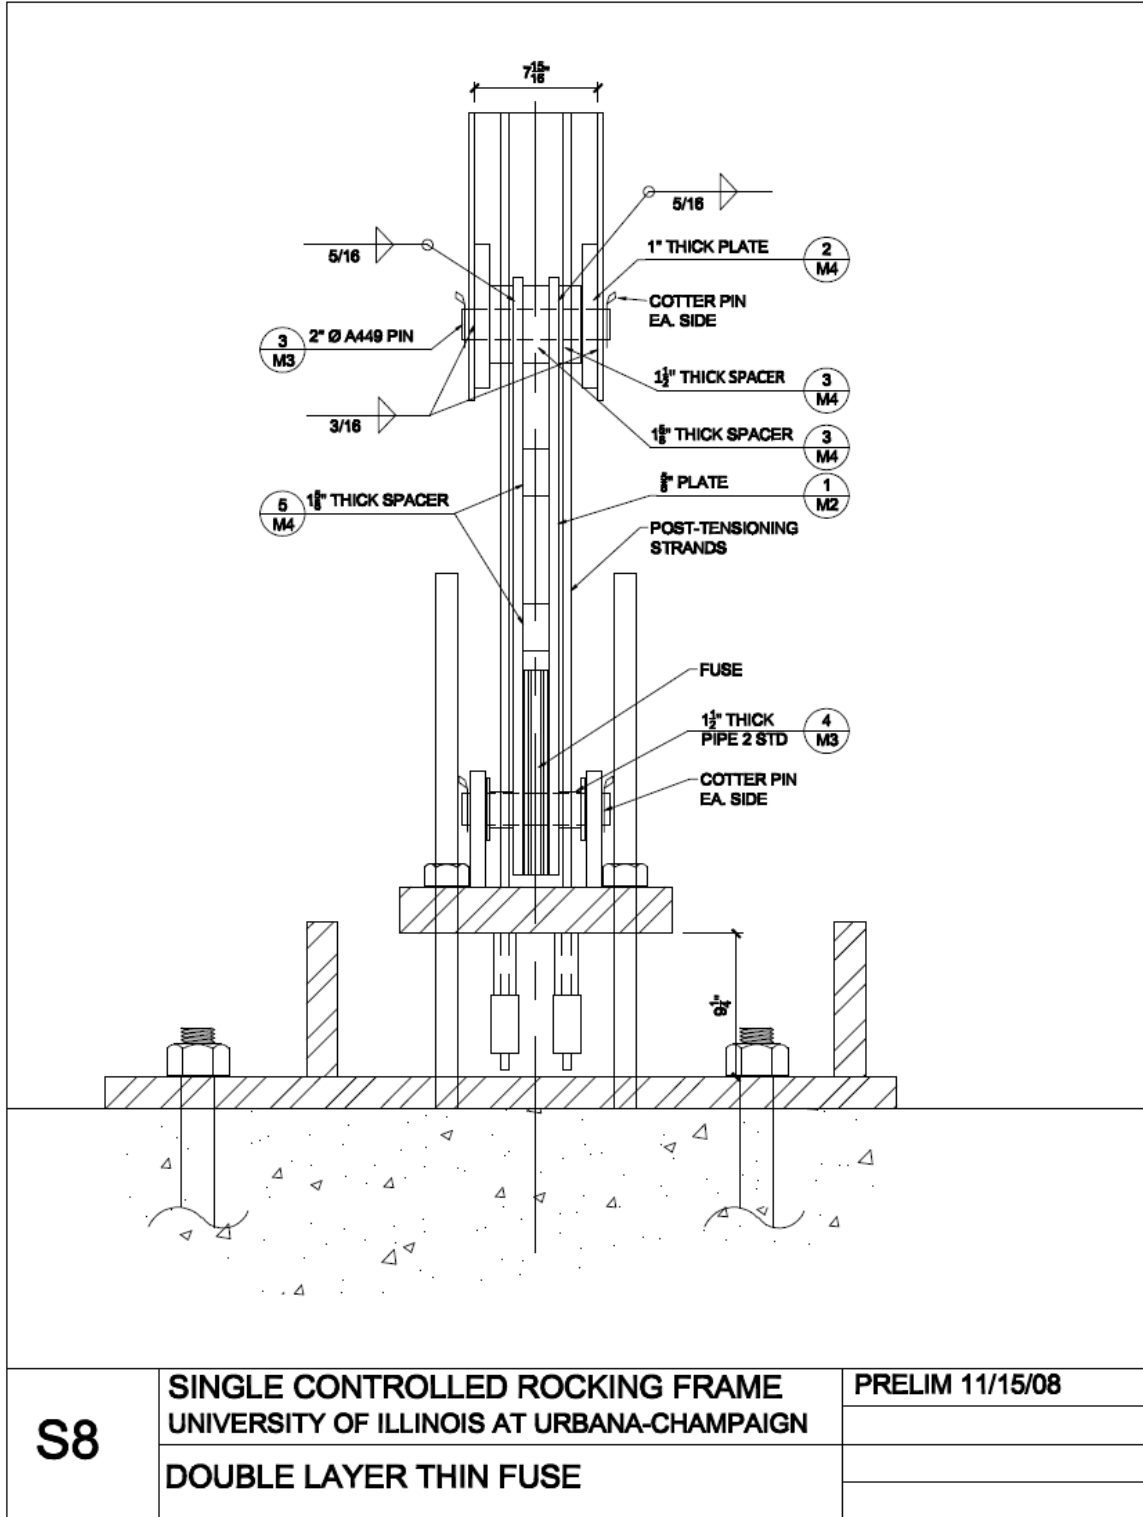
Design Drawing for the Single Frame Configuration – Specimen B2 Side
